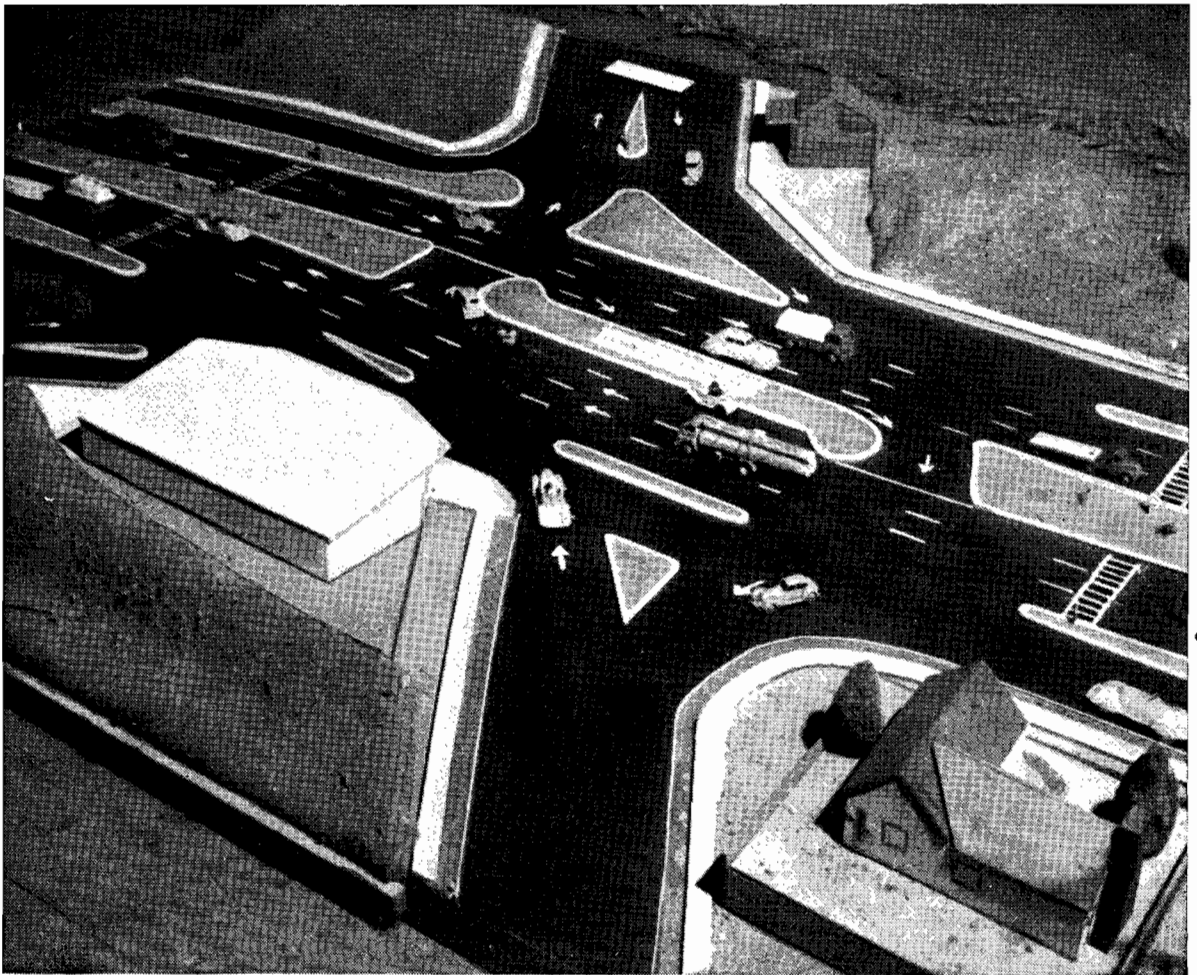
Model of proposed intersection of Princes Highway East and Box Hill Road, Oakleigh.
